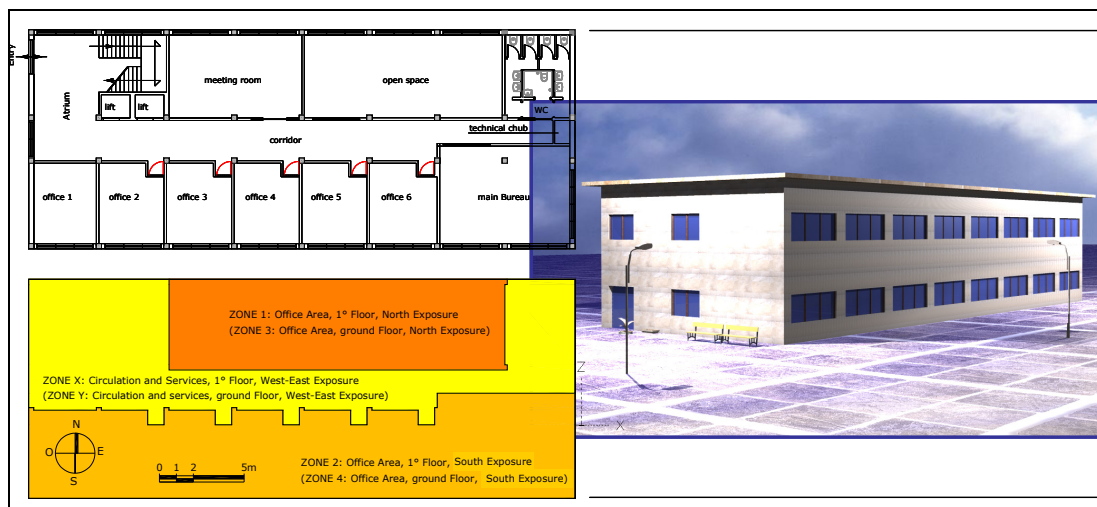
The modelled building; planimetry, thermal zones and volumetric scheme
